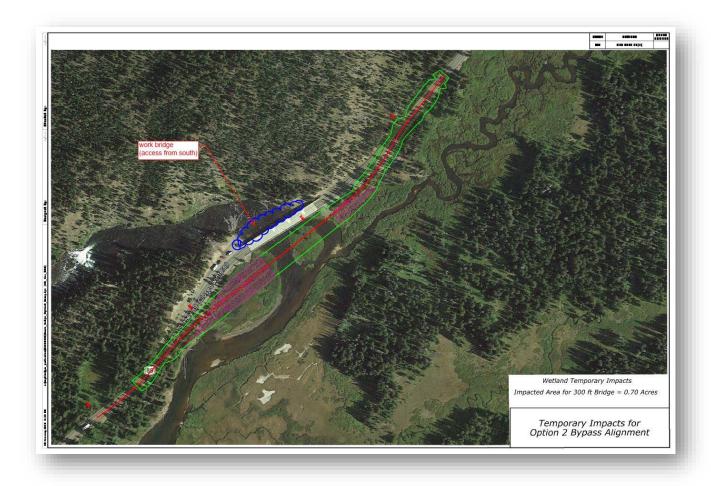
Replace bridge to east of current location, with work bridges west of current bridge.
